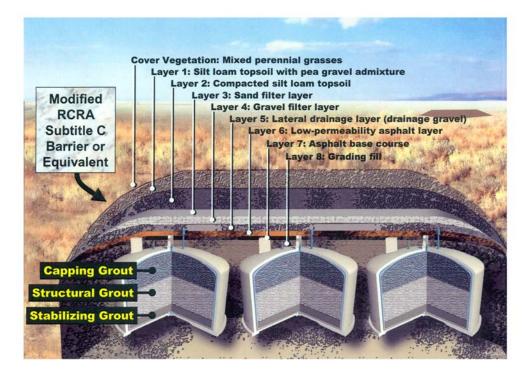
Engineered barrier system to close tank at the Hanford site. A similar plan of engineered grout layers plus a cap system is adopted at the Savannah River Site and the Idaho National Laboratory. SOURCE: Sams, 2005.
